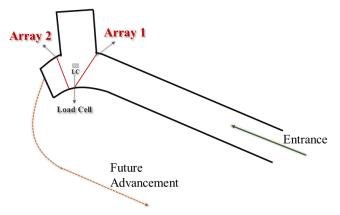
Placement of sensor arrays in split section and opening (plan view).
